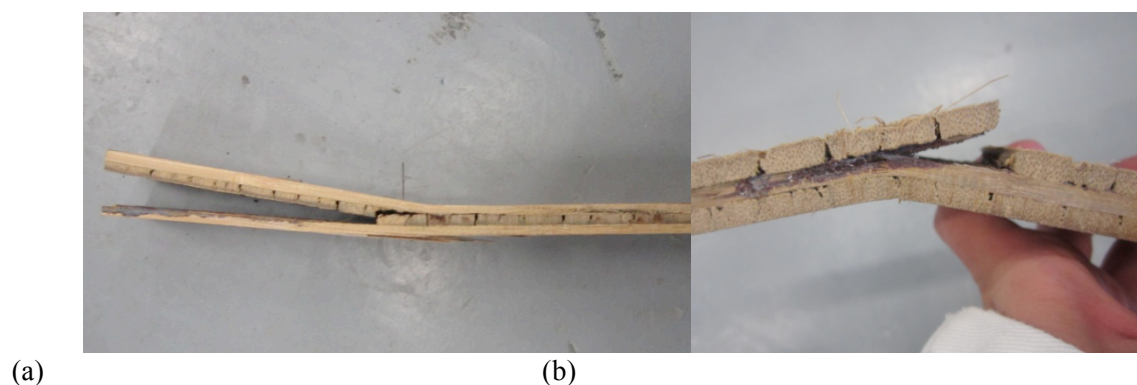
Bending test failure modes: (a) longitudinal specimens; (b) transverse specimens.
